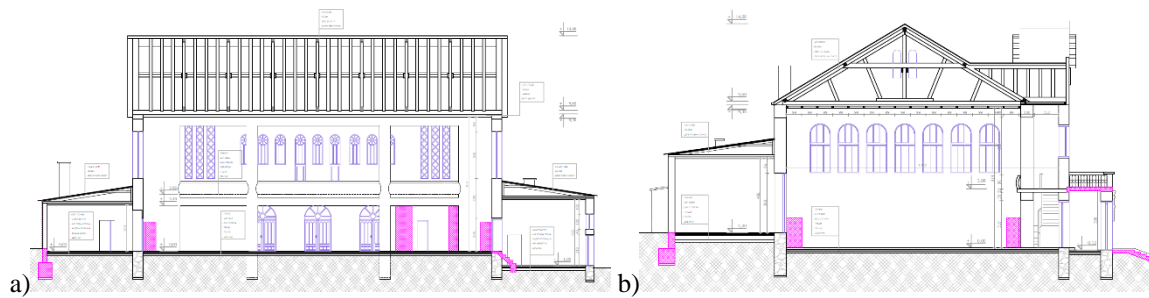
a) Longitudinal cross section of the building, b) Transverse cross section of the building
